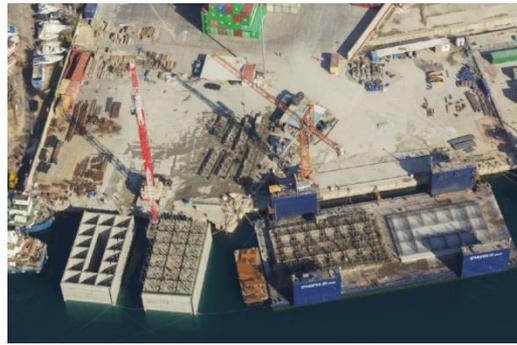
Construction of rectangular caissons using the slipform technique and a semi-submersible dock, Port of Piraeus, Greece (2016)
